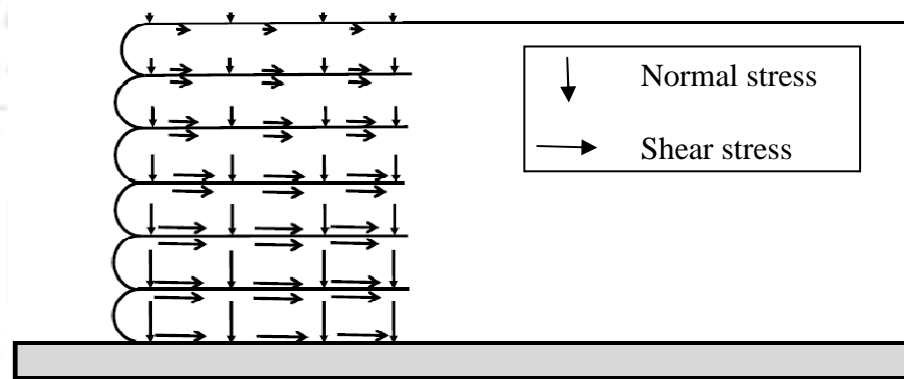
Overburden pressure acting on reinforcement at different elevations
